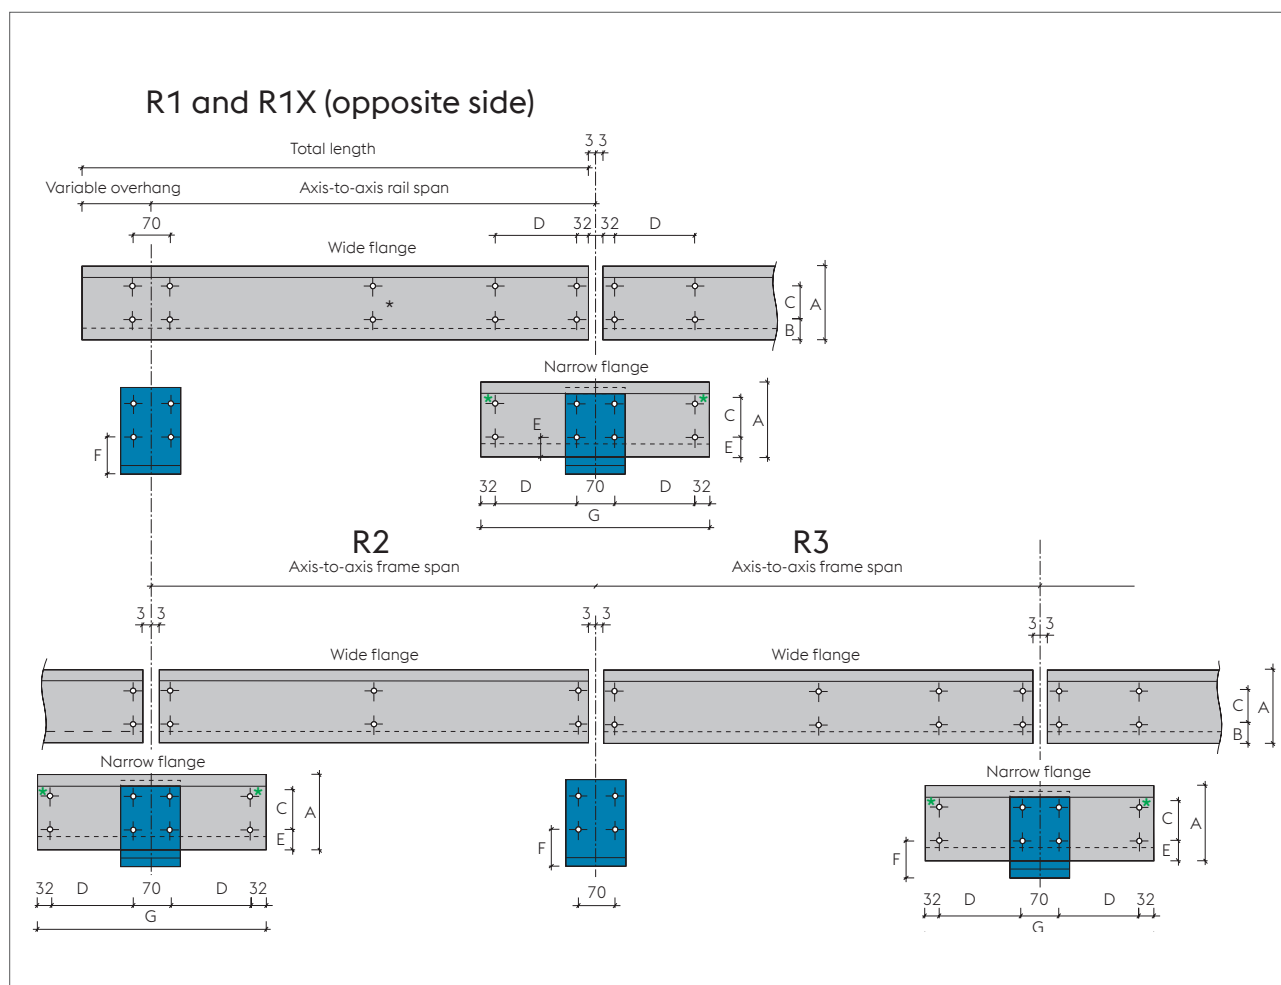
Design details of the SLEEVED side rail system of Z sections
